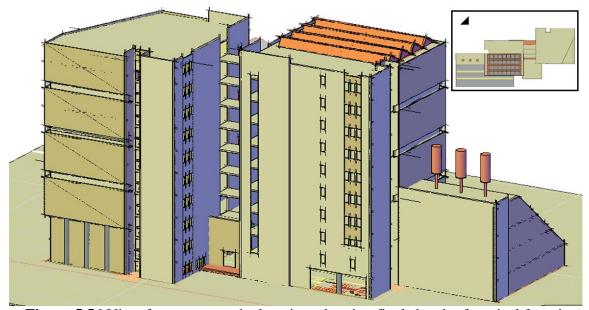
View from west north elevation, showing final sketch of vertical farm in phase 1
